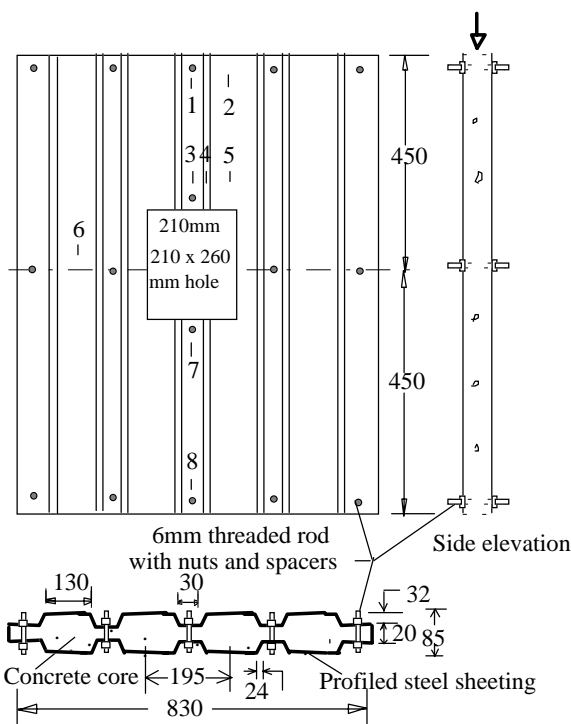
(a): Detailed description and instrumentation of Trimdek pilot walls
